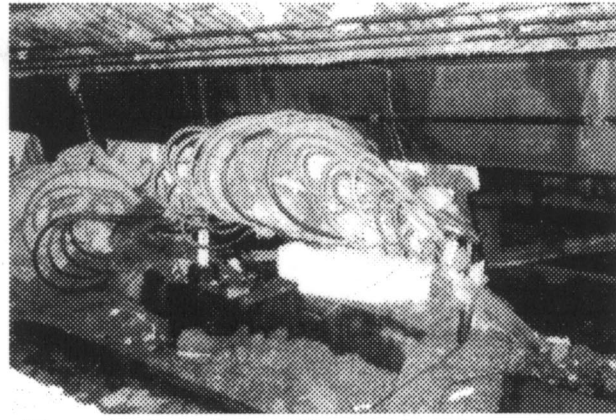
Complete collapse of center columns (the first pattern of collapse)
